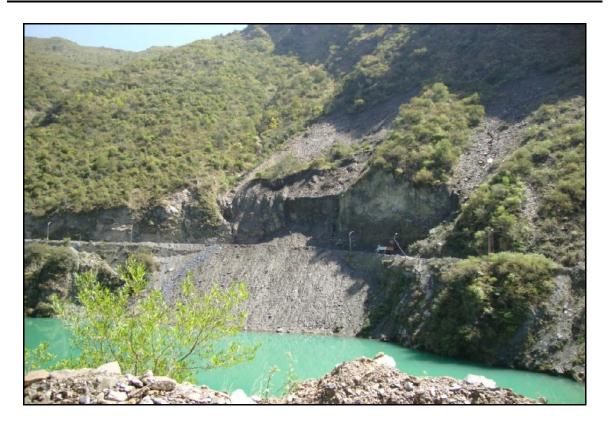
View of Slope LBS1 Located 250 m d/s of Zero Bridge
